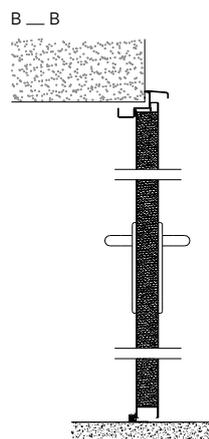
Vertical cross-section of the ECO BASIC external steel seamless door with a corner frame
